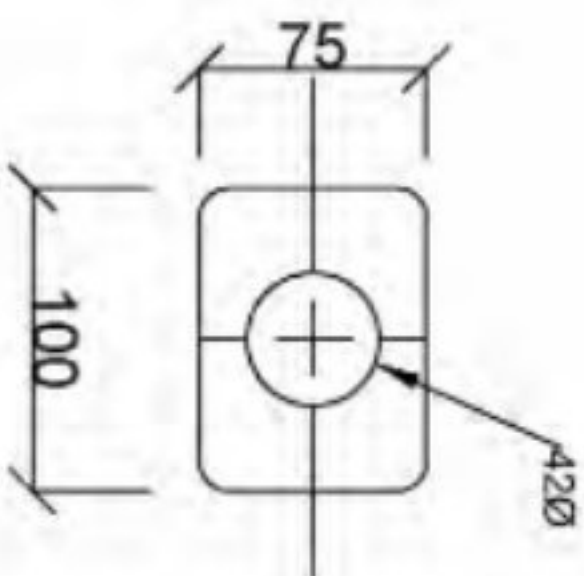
DETAIL OF CONTINUOUS ANCHOR BLOCK:
